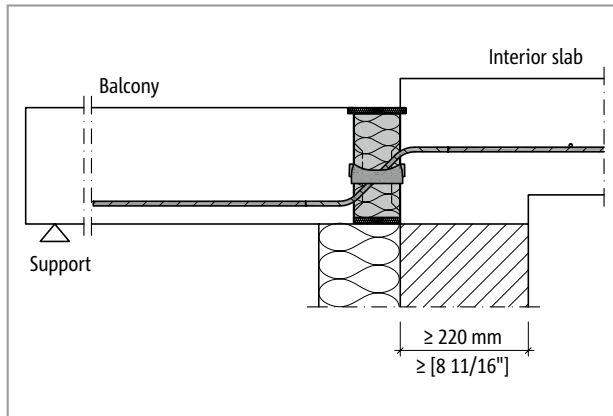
Schöck Isokorb® T Type CQ: Connection with a small interior slab step (e.g. T Type CQ-V6 to CQ-V12)
